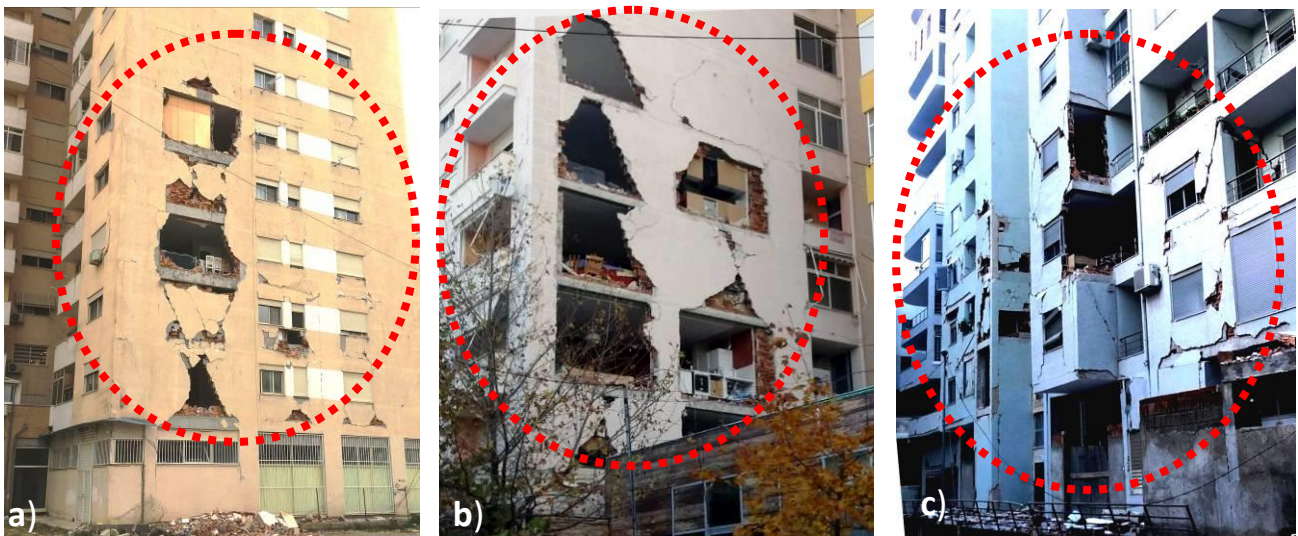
Collapse of unreinforced masonry facades of multi-story R/C buildings at Durres, Albania (2019).
